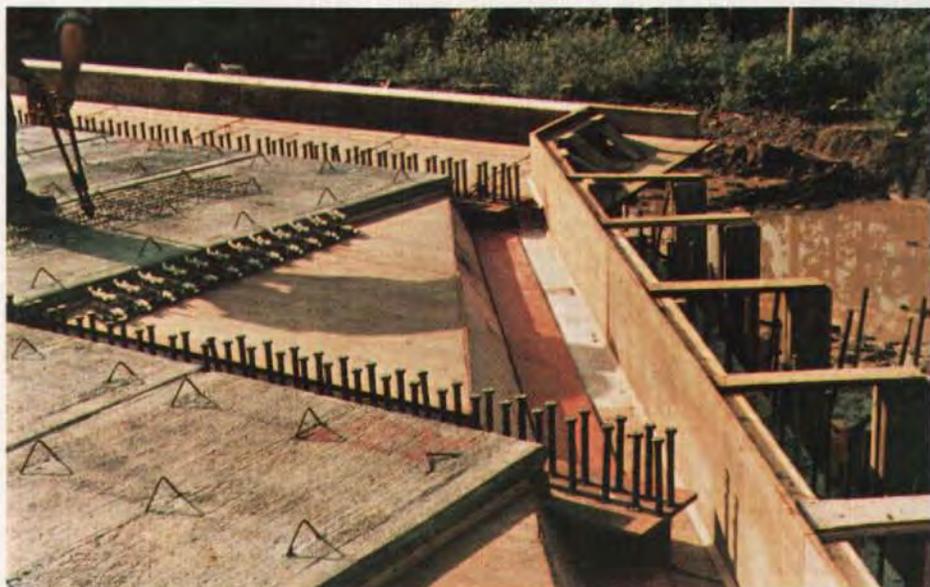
Details at skewed end of a 33 WF steel beam three span bridge in Bureau County, Illinois. The 45 degree skewed end section was formed and poured full depth in the field.
